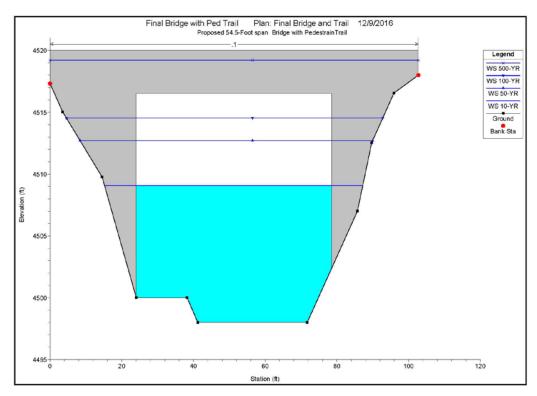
Cross-section of bridge Option 1 at RS 4+00 of the proposed bridge and pedestrian underpass. 100-year WSEL is at 4514.6 feet and lower chord of the proposed bridge deck is at 4516.5 feet for a freeboard of 1.9 feet.
